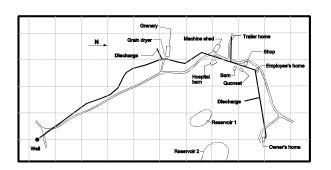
Layout of piping system for the Diamond Ring Ranch.
